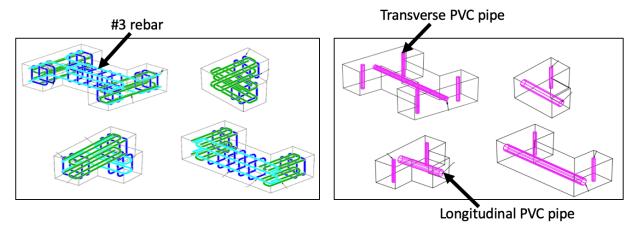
Individual tile reinforcement details (left); transverse and longitudinal PVC pipes (right).
